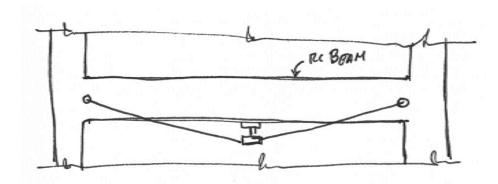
Side view of a concrete beam reinforced with pretension cables supporting an intermediate support
